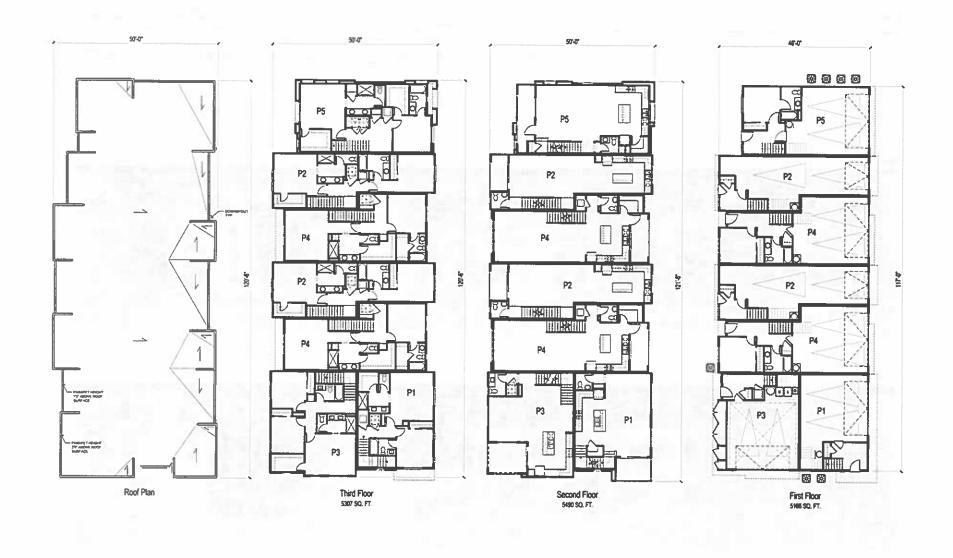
Conceptual Architecture - 7-Plex Building Floor Plan "B"
